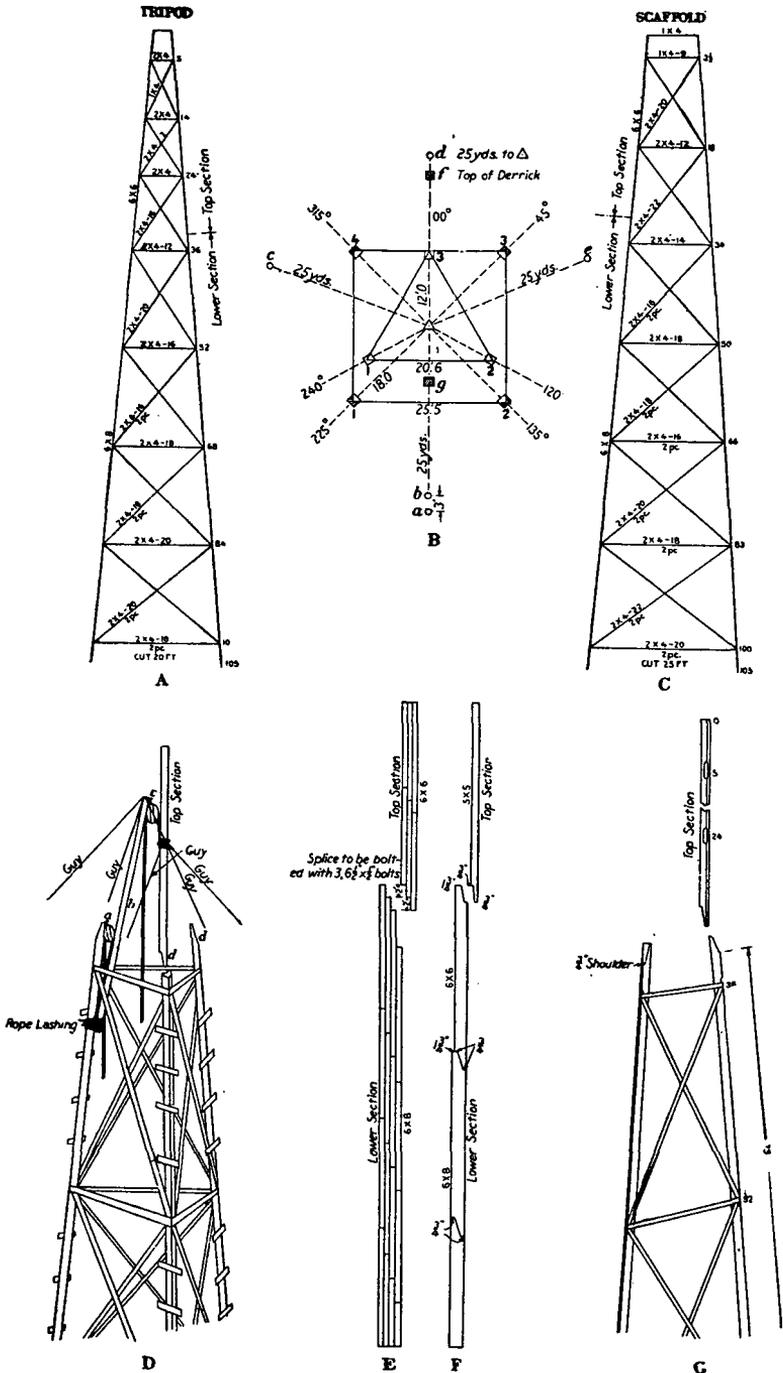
Working drawings for 100-foot signal showing arrangement of tackle for raising top section of tripod.
